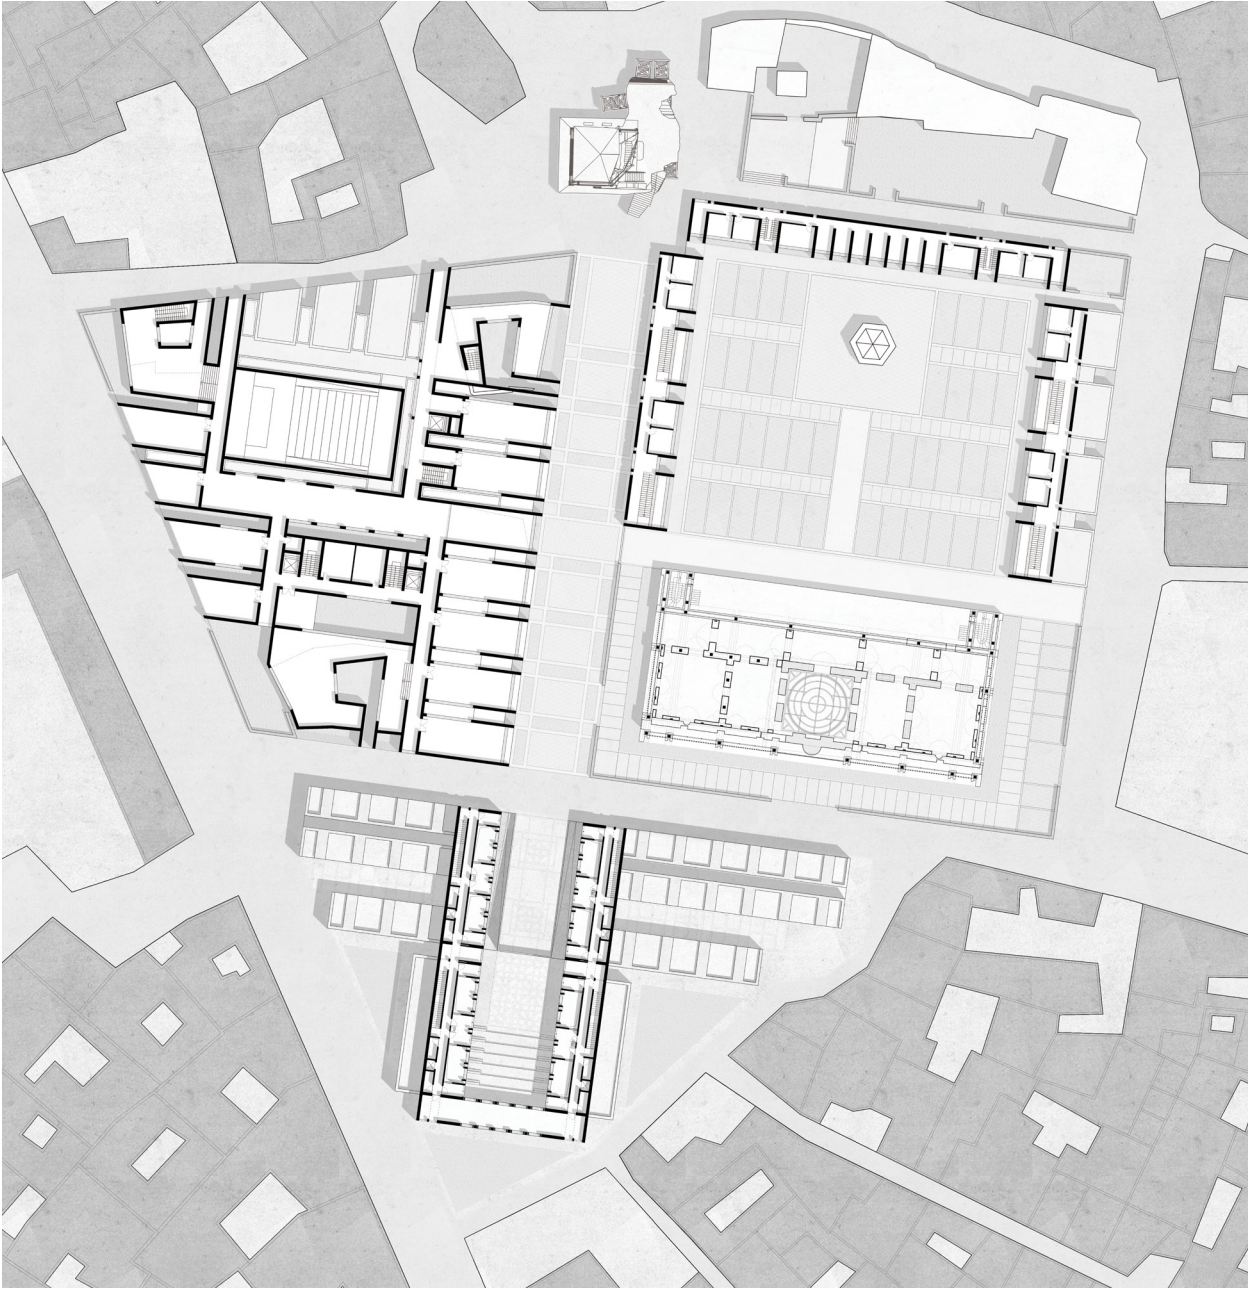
First Floor Plan of The Al-Nouri Mosque Complex
